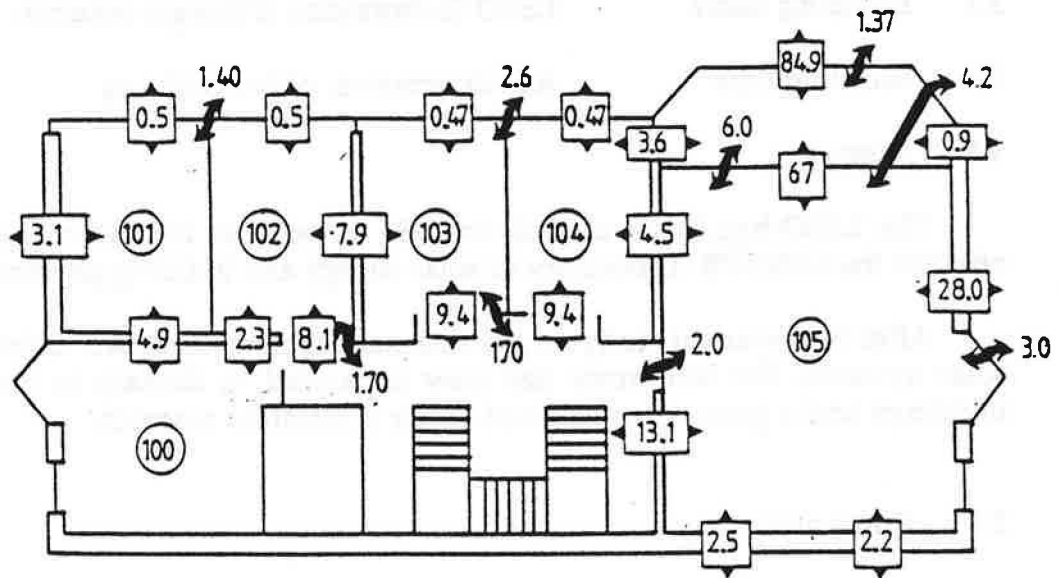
Thermal conductances in [W/K] between rooms and also with outside. Second floor.
